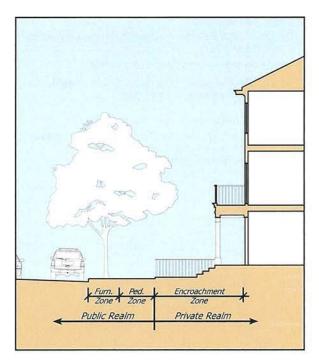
Cross Section, Dooryard Frontage (Illustrative)
